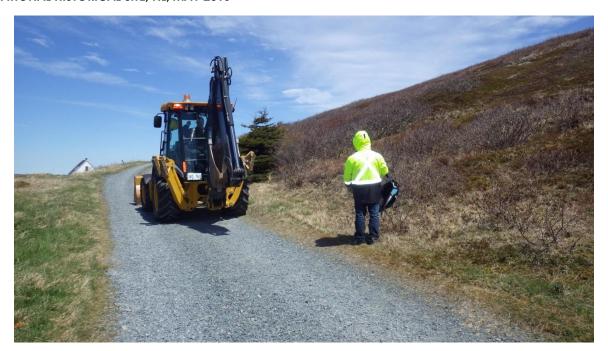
Location and context of Test Pit 9 (Suboperation 5A10C) prior to excavation.
